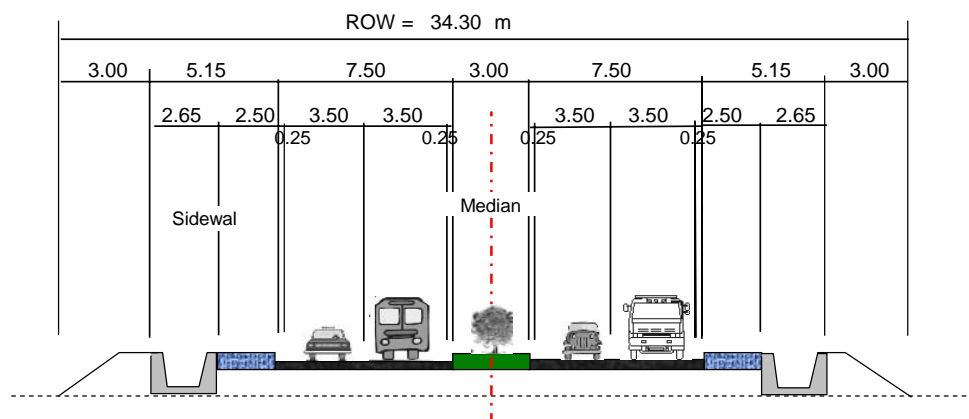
Typical Cross Section of Trans-Sulawesi Road (Perintis Kemerdekaan Road)
